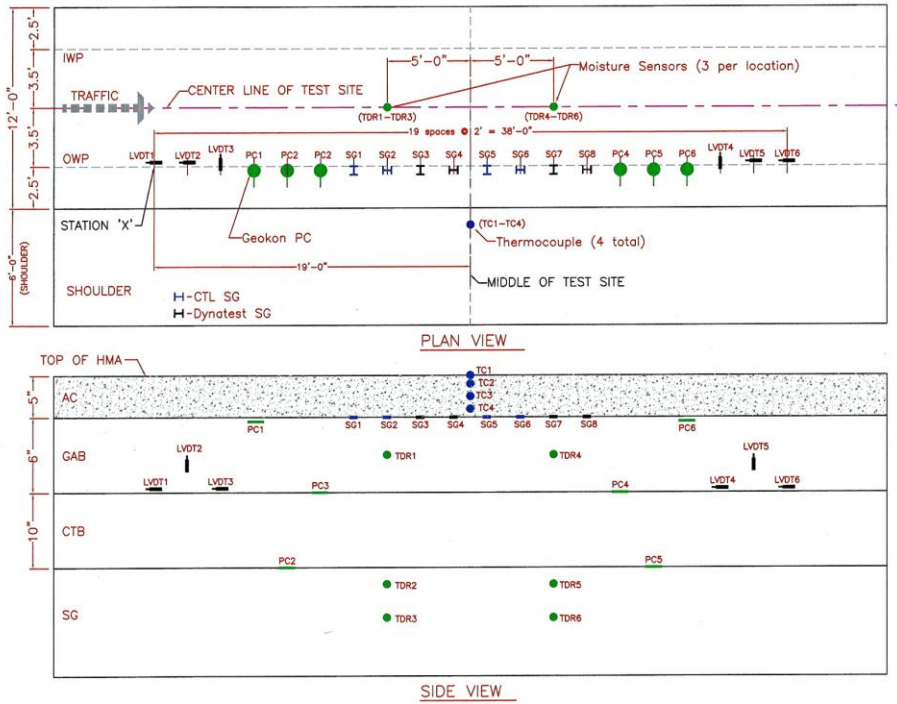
Plan and side views of sensors installed in the Virginia inverted pavement structure.
